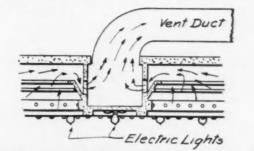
Ornamental Ceiling Beams as Concealed Vent Ducts.
